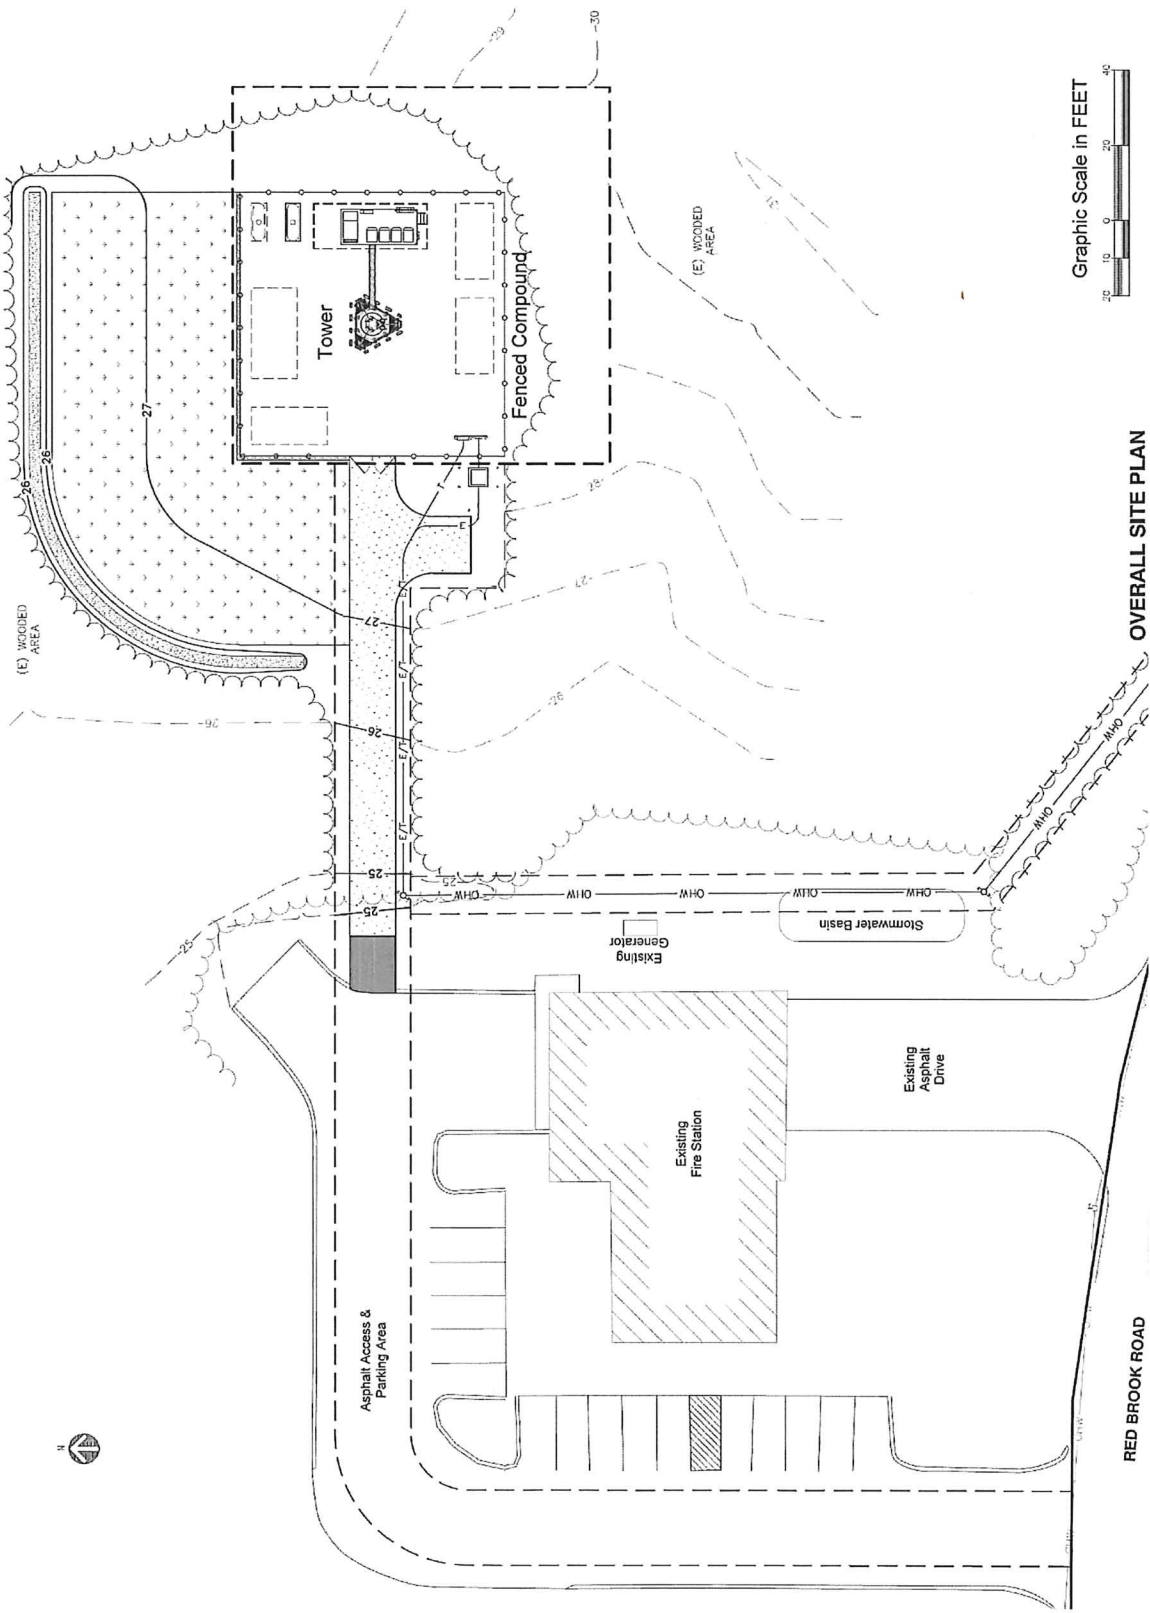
Plan Showing the Equipment Compound and the Existing Fire Station
